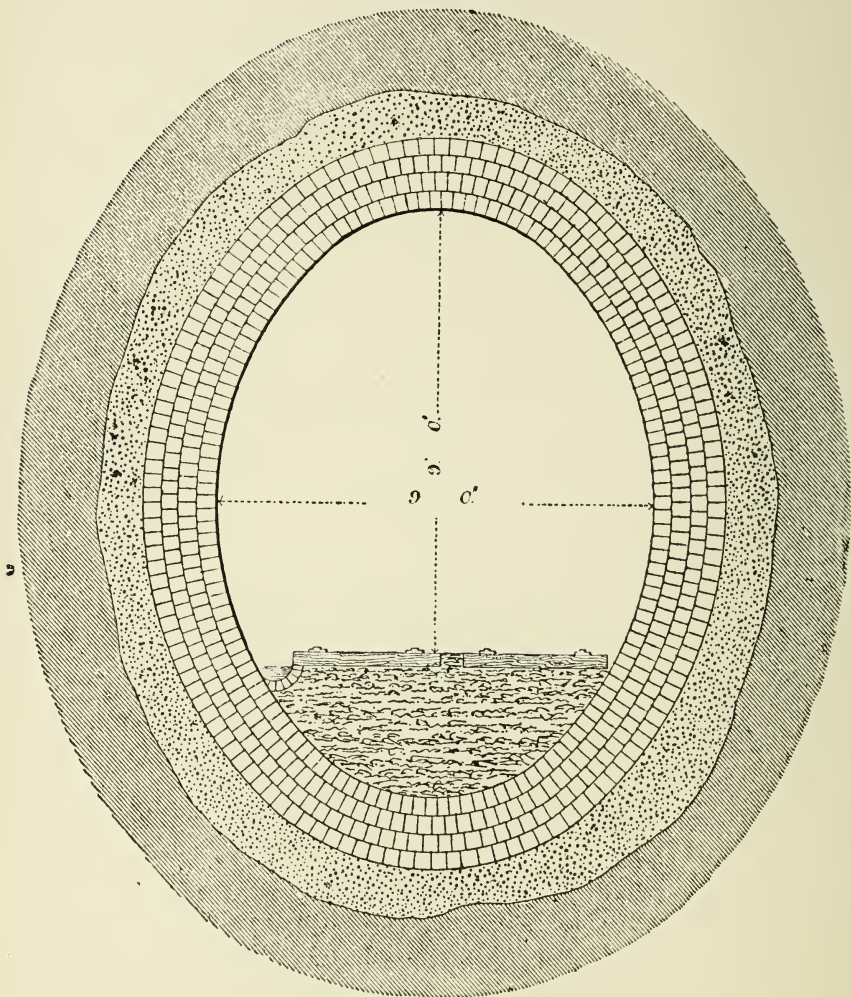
SECTION OF ELLIPTICALLY ARCHED ROADWAY, HAVING ONE FOOT OF SAND INTERPOSED BETWEEN THE ARCHING AND STRATIFICATION, AND SHOWING A DOUBLE LINE OF RAILS LAID, AND GUTTER FORMED IN IT.
